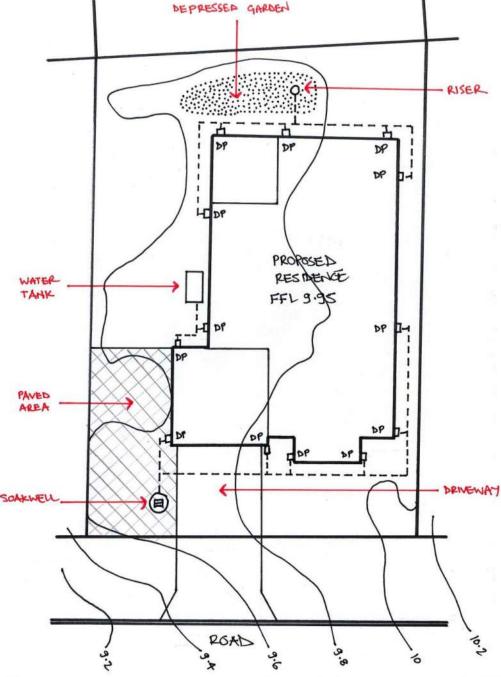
Stormwater Plan for an A Class site (example only and not to scale)
